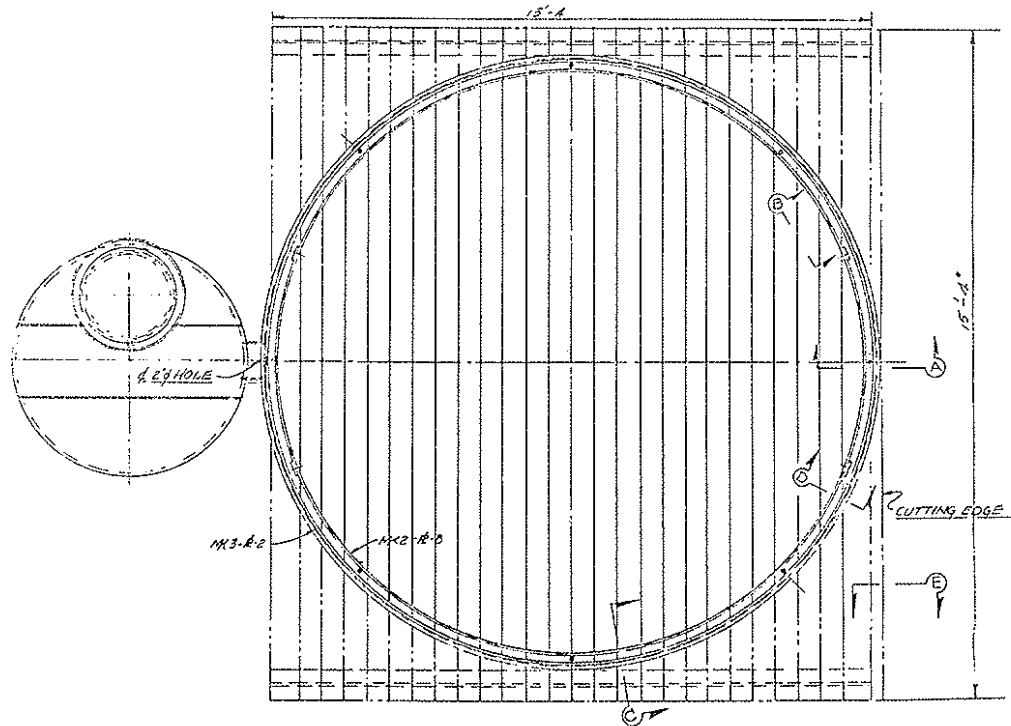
Plan view of lysimeter showing inner and outer cylinders, floor plate sections and instrument well.
